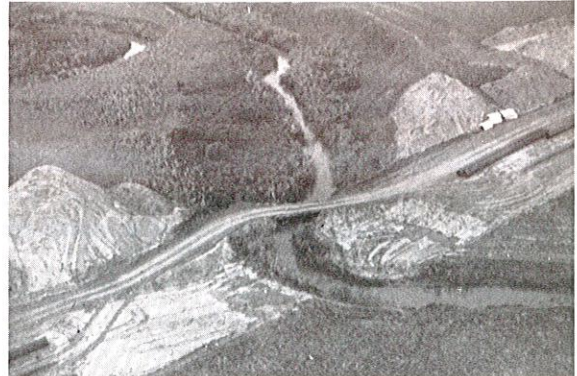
TEMPORARY TIMBER BRIDGE. This bridge was placed for access across a stream during pipeline construction.
